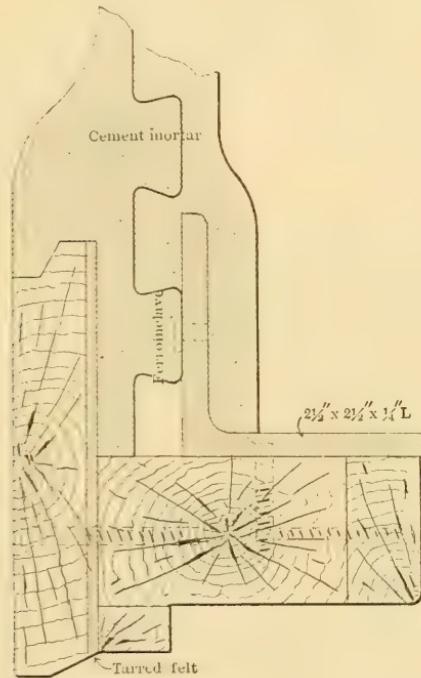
SECTION THROUGH WINDOW LINTEL.
